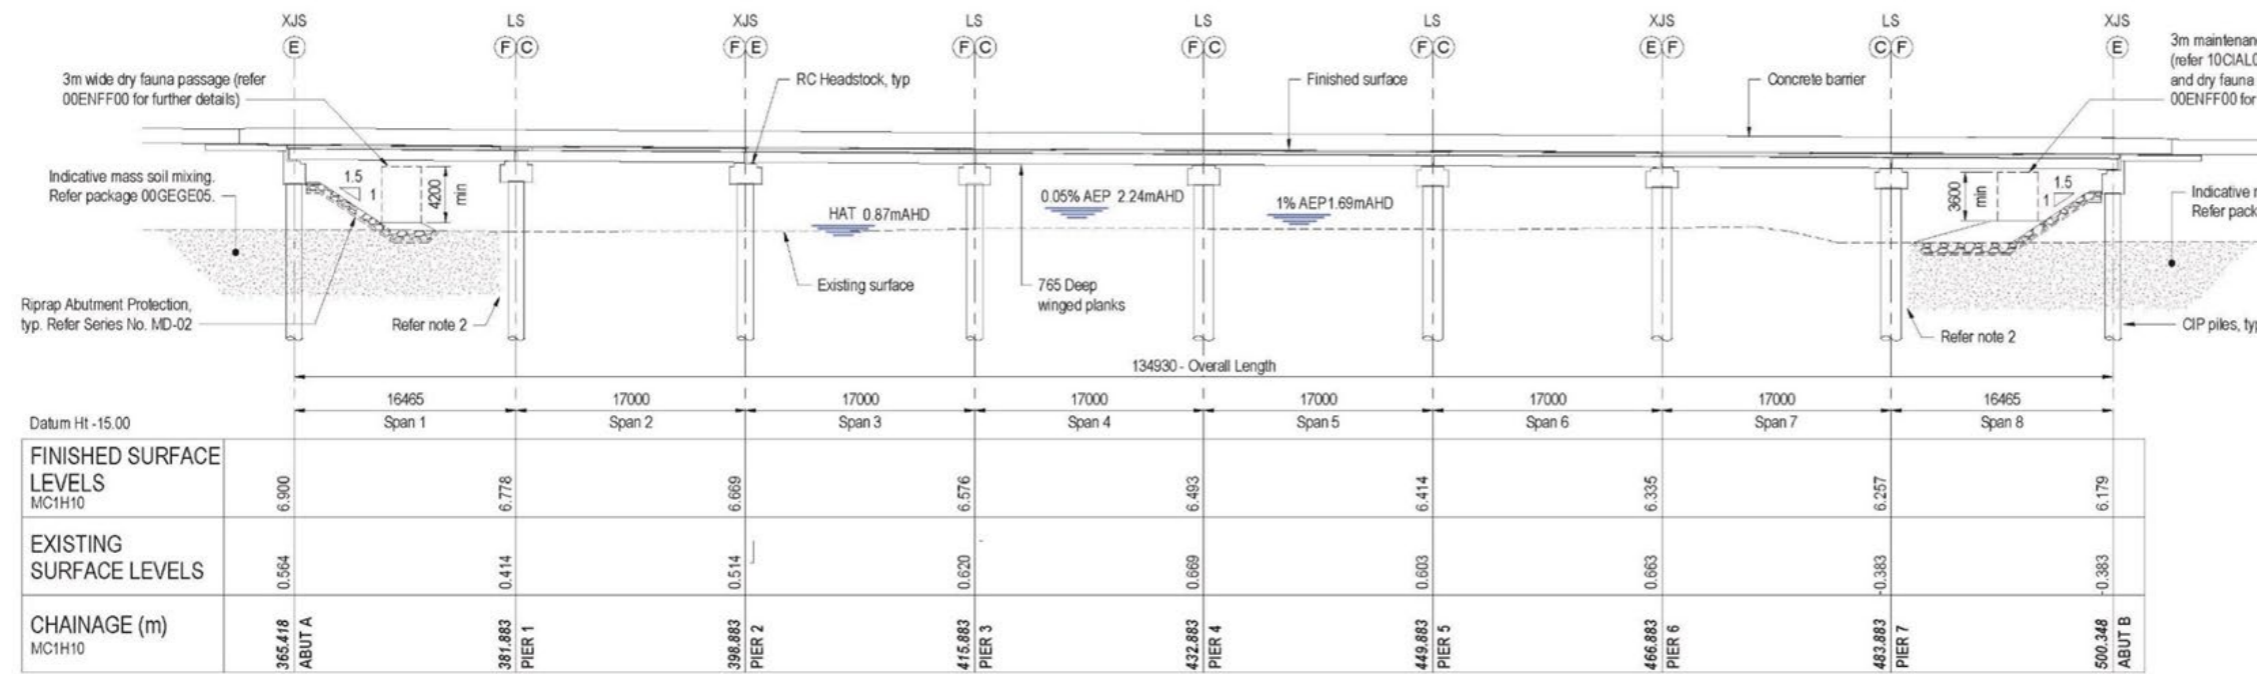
(i) - Example General Arrangement drawing 1 of 3 for winged plank bridge
